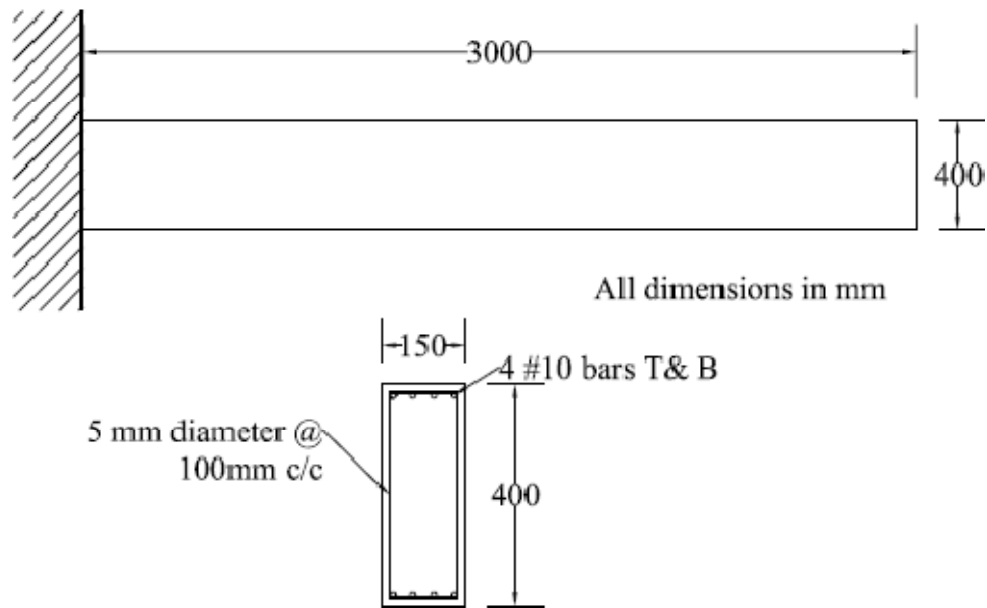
Elevation and Cross-Section of the Cantilever Beam
